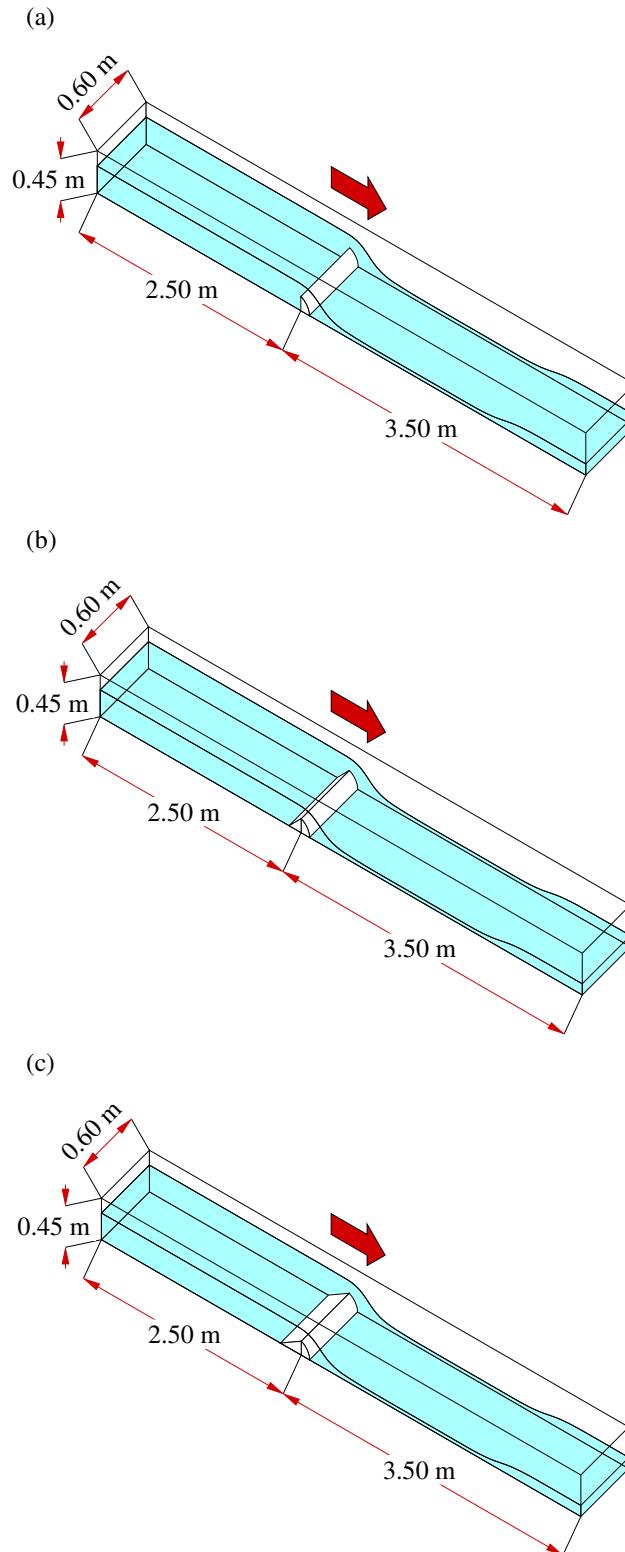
Schematic drawing of the test section in birds-eye view: (a) 90° standard, (b) 45° modified, and (c) 30° modified spillways.
